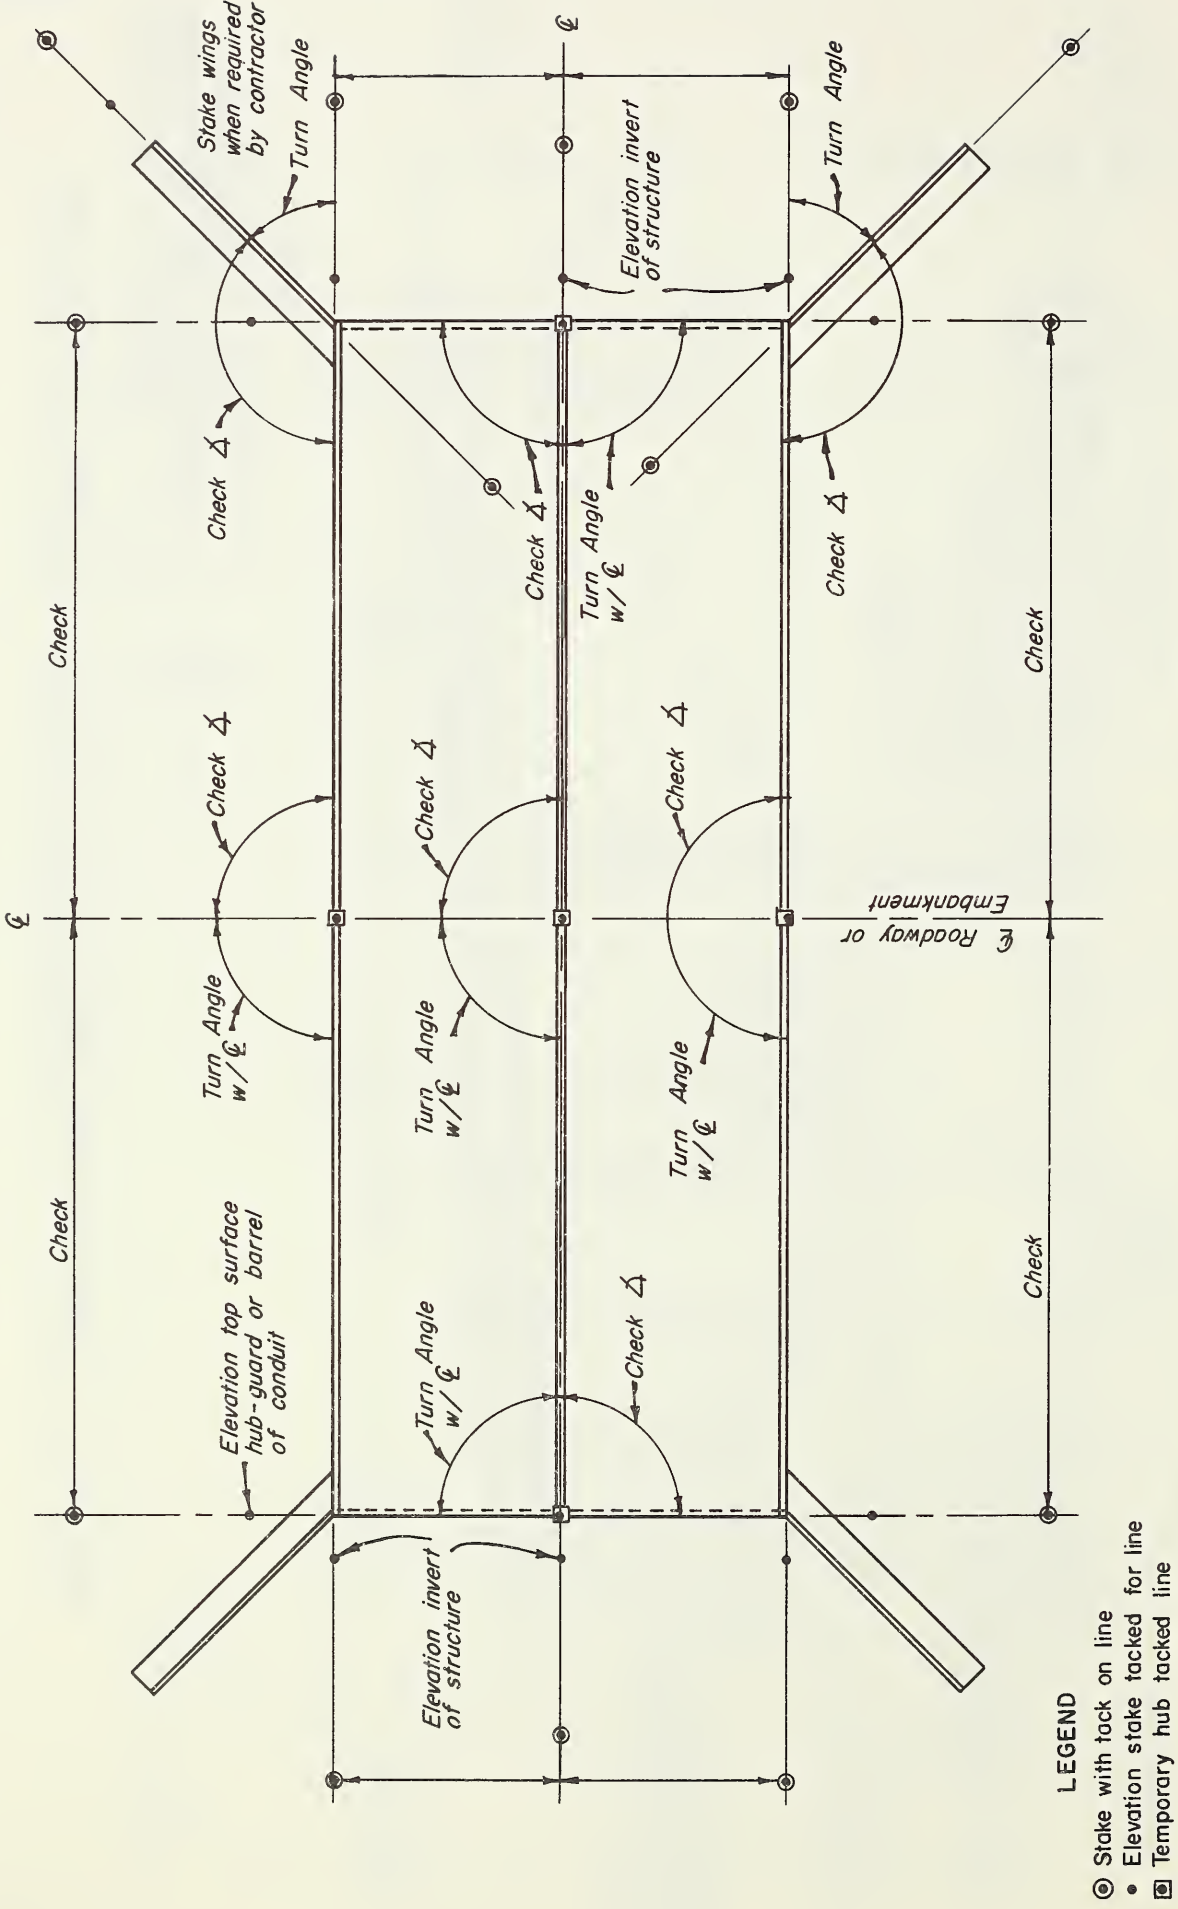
EXAMPLE FOR STAKING MULTIPLE BOX CONDUITS
